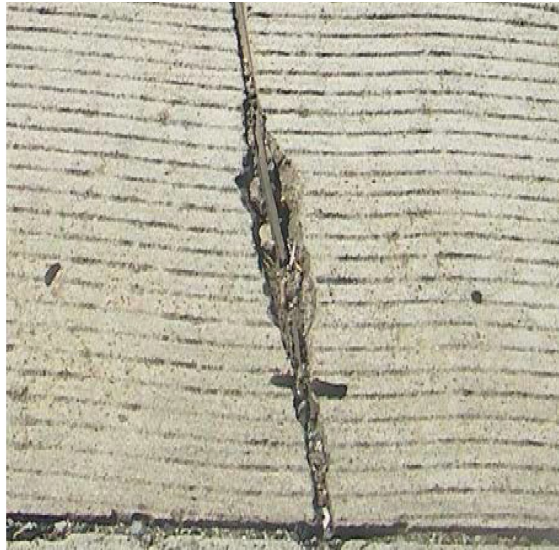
Spalling due to incompressible joint damage (Harrington et al., 2018).
